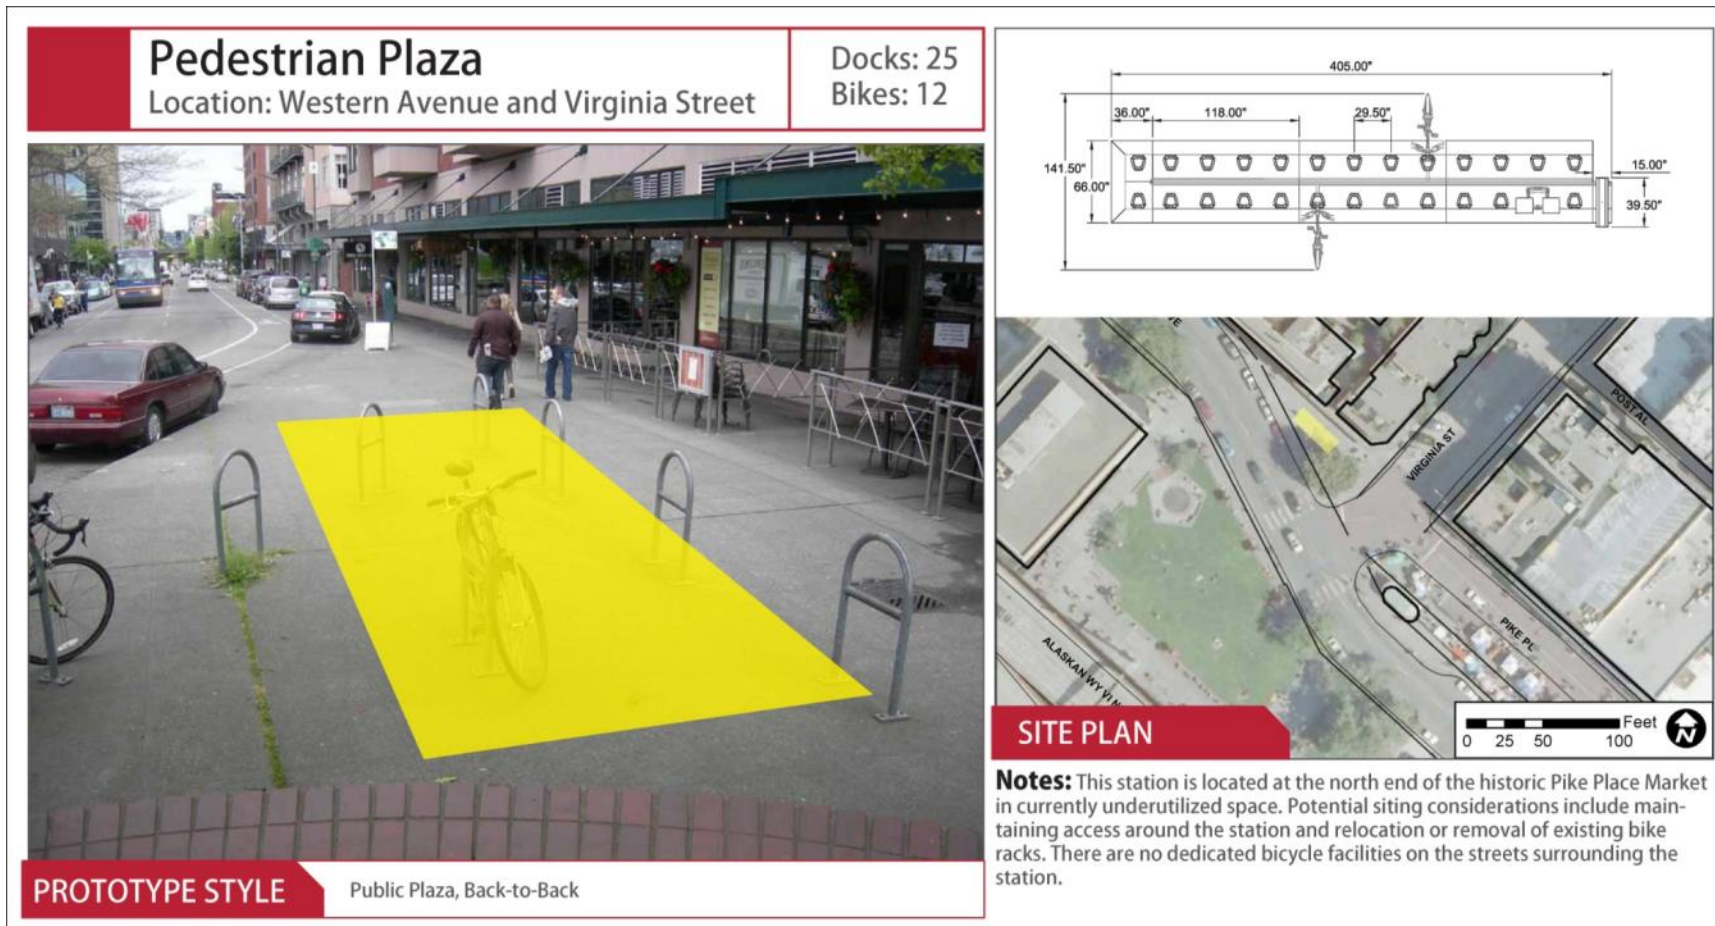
Station Example – Pedestrian Plaza (Virginia Street and Western Avenue).
